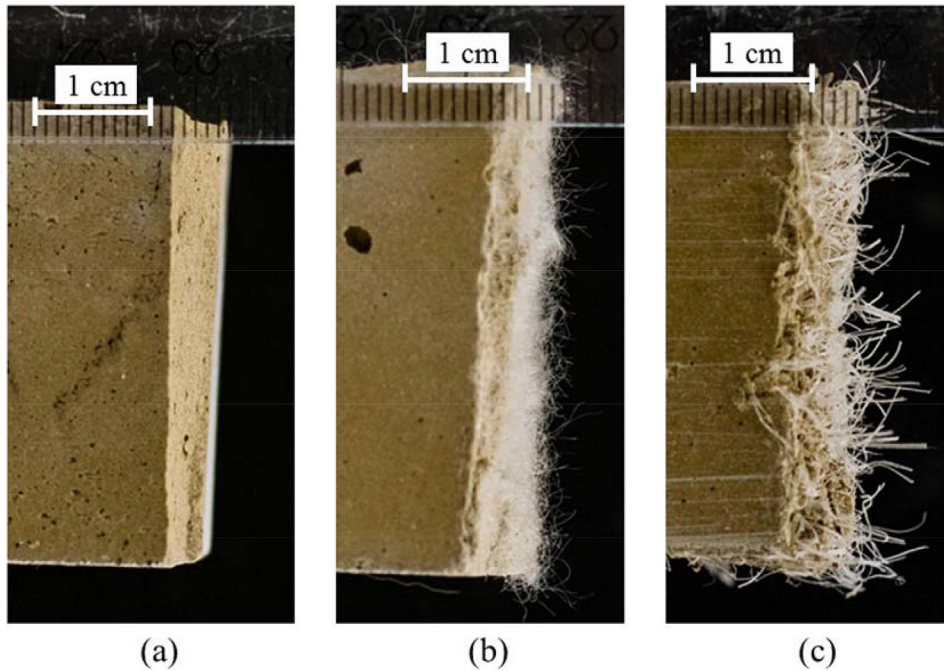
Fracture toughness tests: representative fracture surface of: (a) Reference, (b) 2PP-MF and (c) 2PP-SF.
